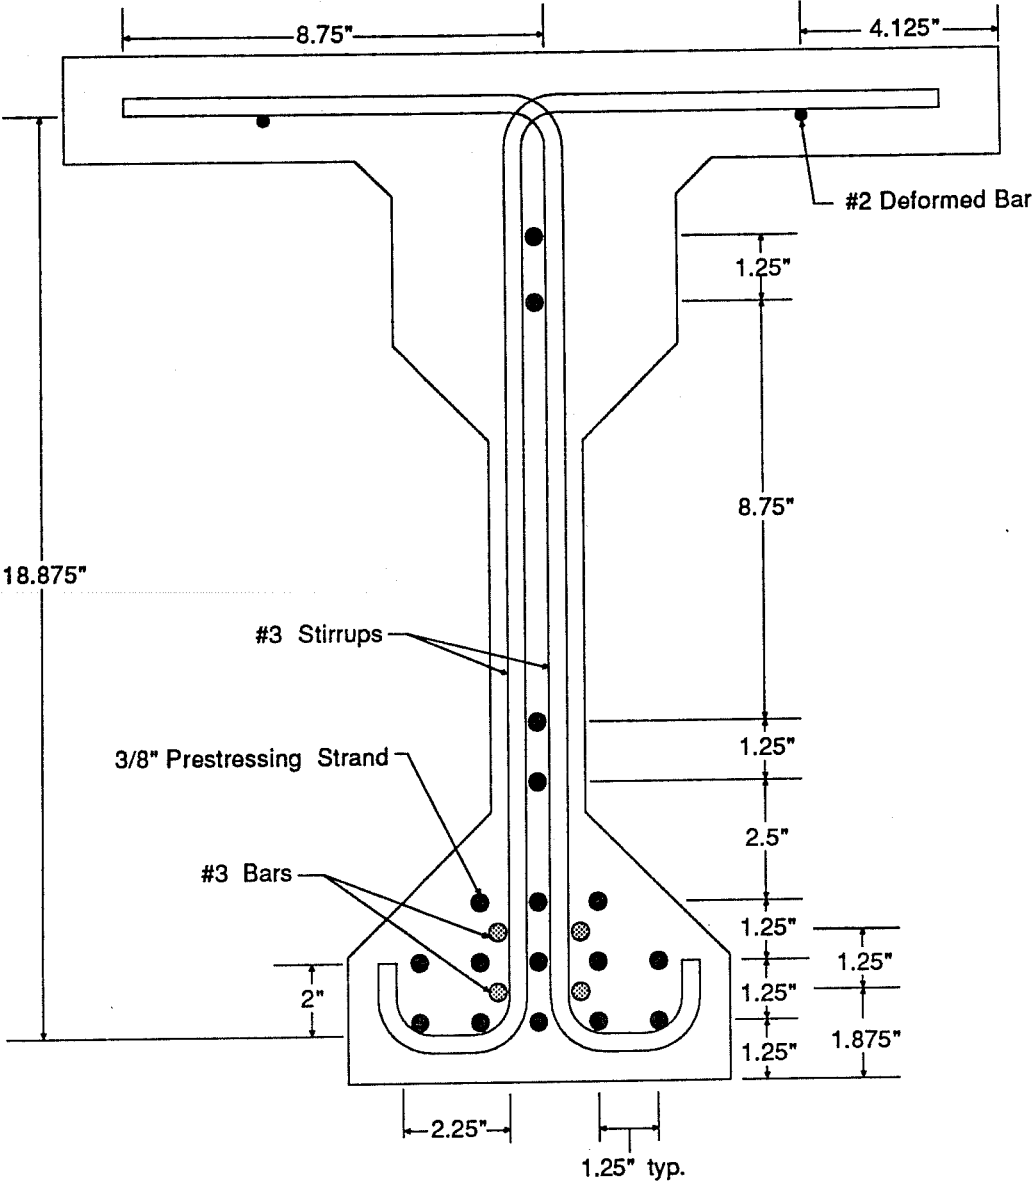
Modified stirrup detail, Specimen 2-3.
